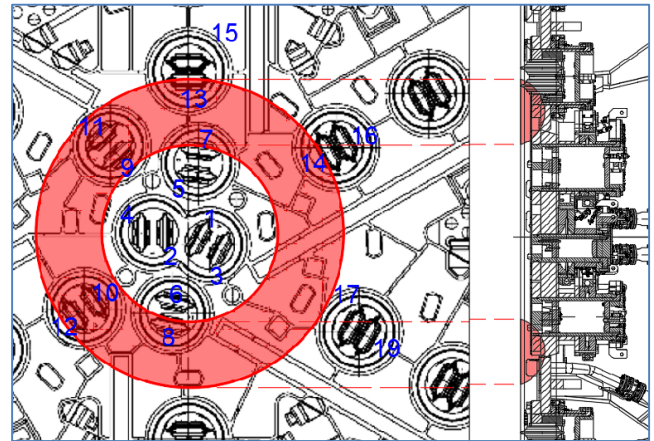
Cutterhead and panel wear of the 16th ring on the left line.
